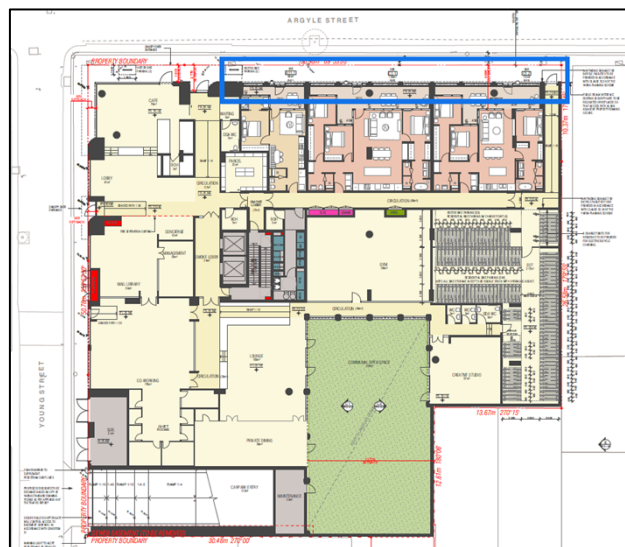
Advertised plans dated 08.10.2025 showing planters along the Argyle Street façade outlined in blue (Source: FK Architects, dated 10.03.2026)
